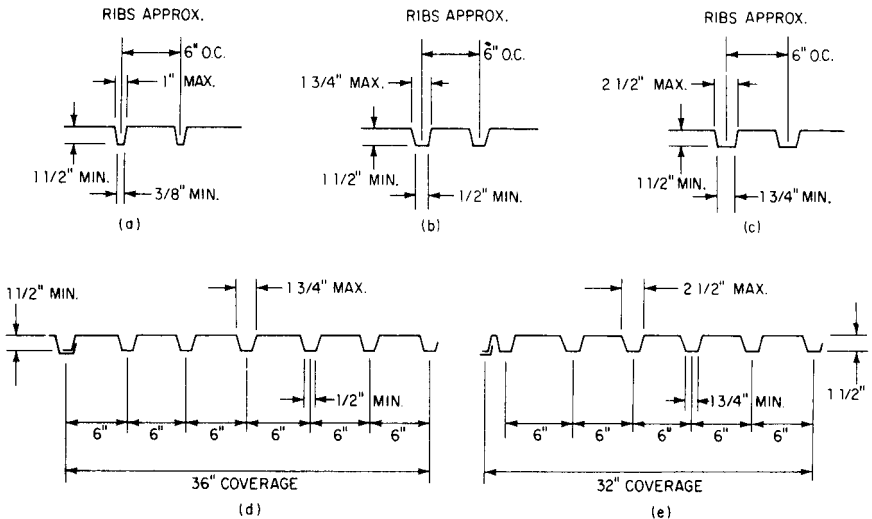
Typical cold-formed steel roof-deck sections. (a) Narrow rib; (b) intermediate rib; (c) wide rib; (d) intermediate rib in 36-in-wide sheets with nested side laps; (e) wide rib in 32-in-wide sheets with upstanding seams.
